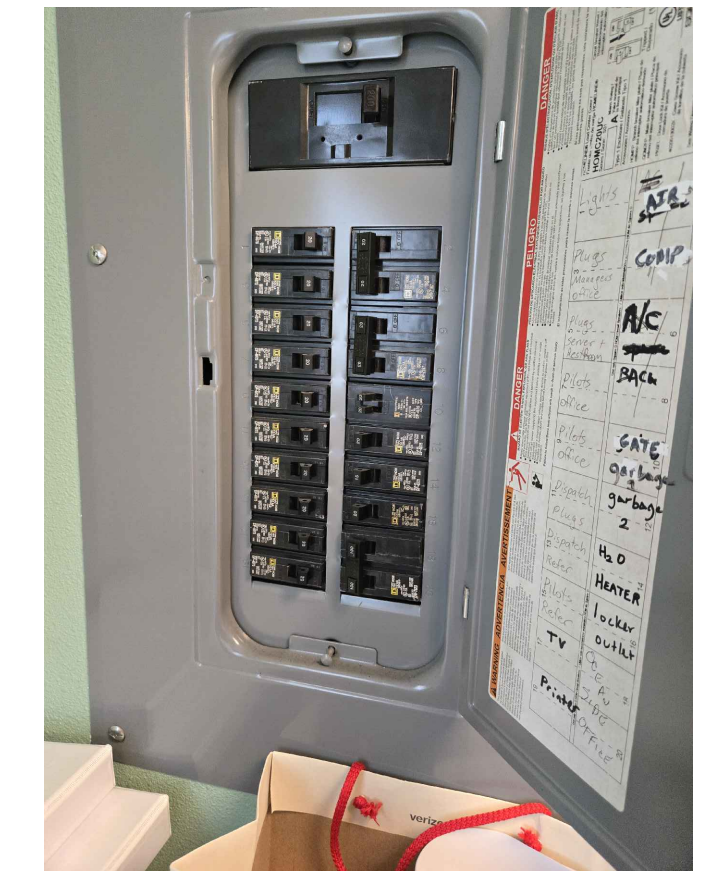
PILOT'S ASSOCIATION BUILDING
